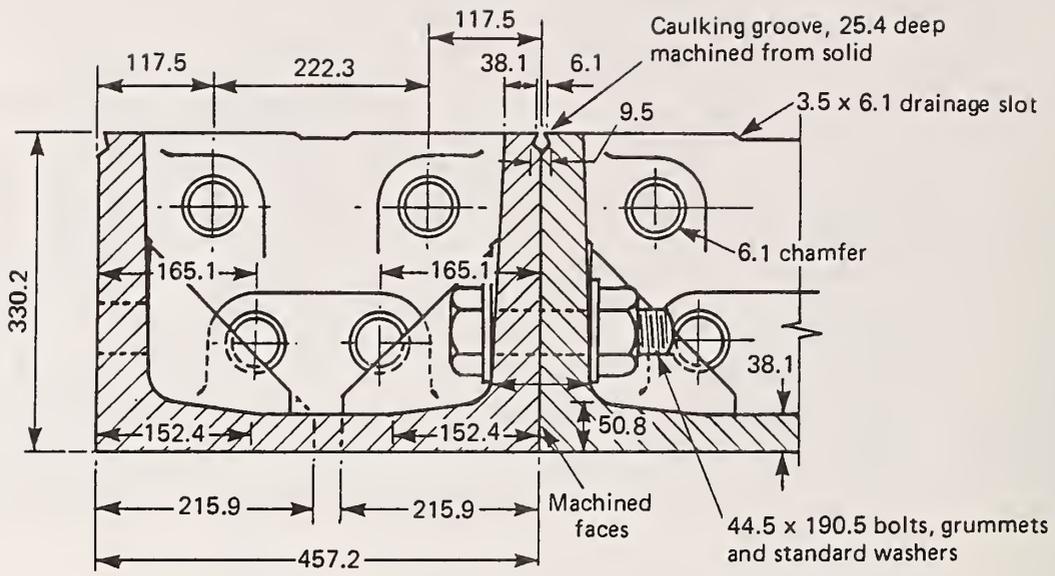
TYPICAL CHANNEL SECTION SEGMENTS
